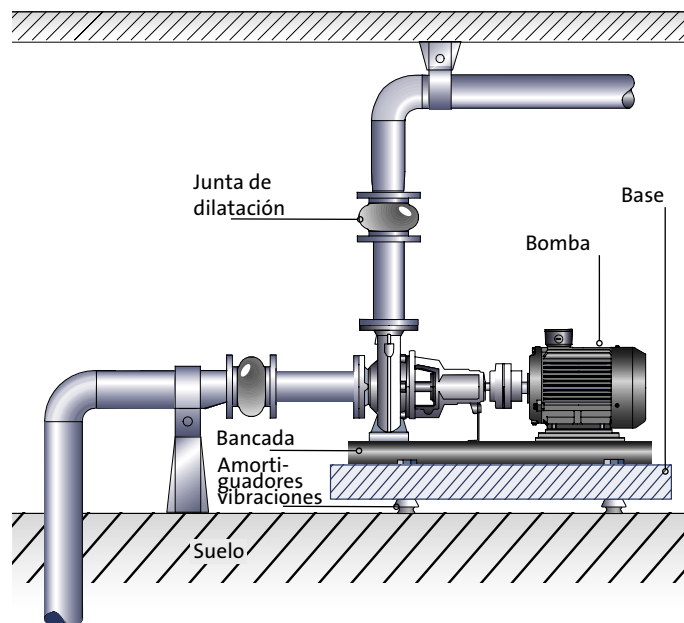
Installation with expansion joints, vibration dampeners and fixed pipework
